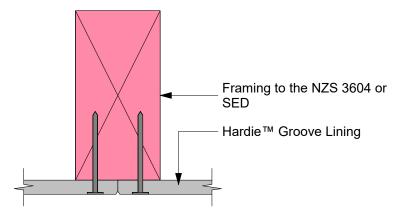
Hardie™ Groove Lining sheet edge and groove detail
